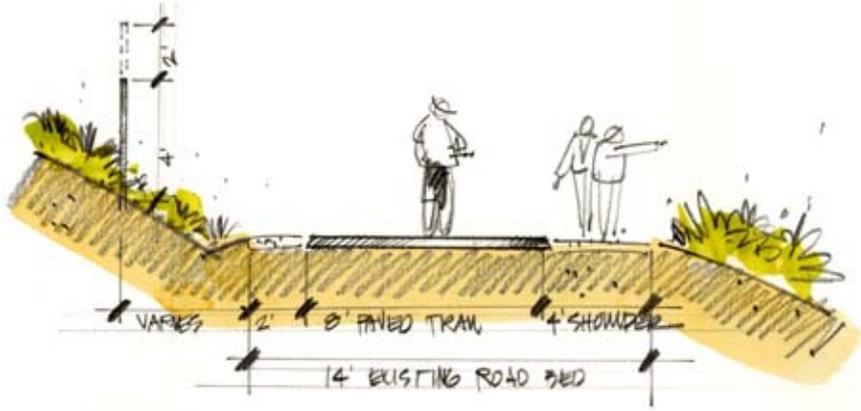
Paved Multi-Use Trail in Landfill on 14' Road Bed
